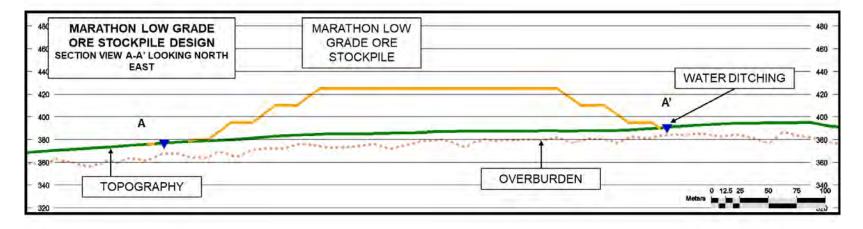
Marathon Low-grade Ore Stockpile Design – Section View A-A' Looking Northeast
